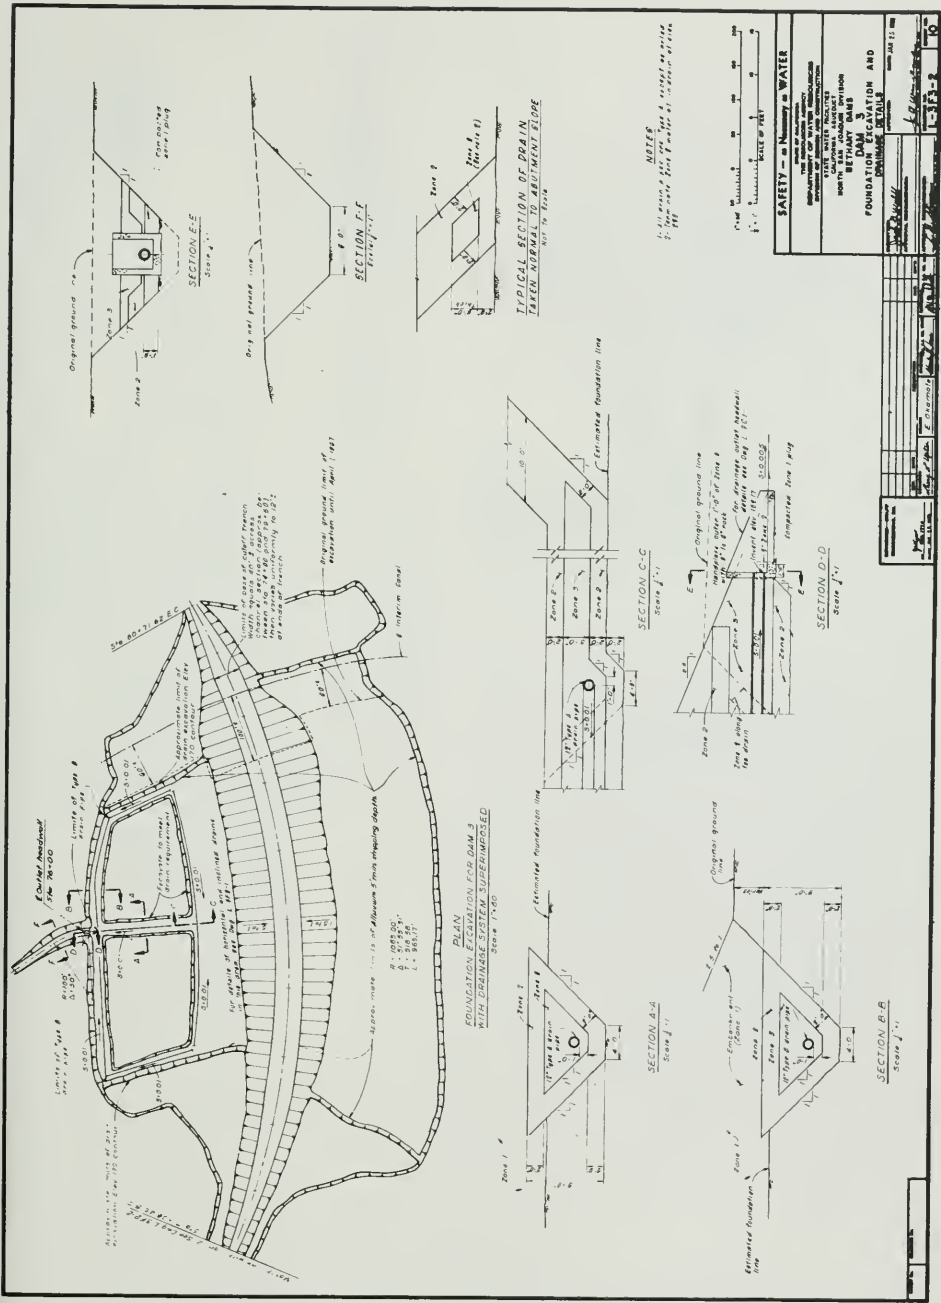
Foundation Excavation and Drainage Details—Dom No. 3
